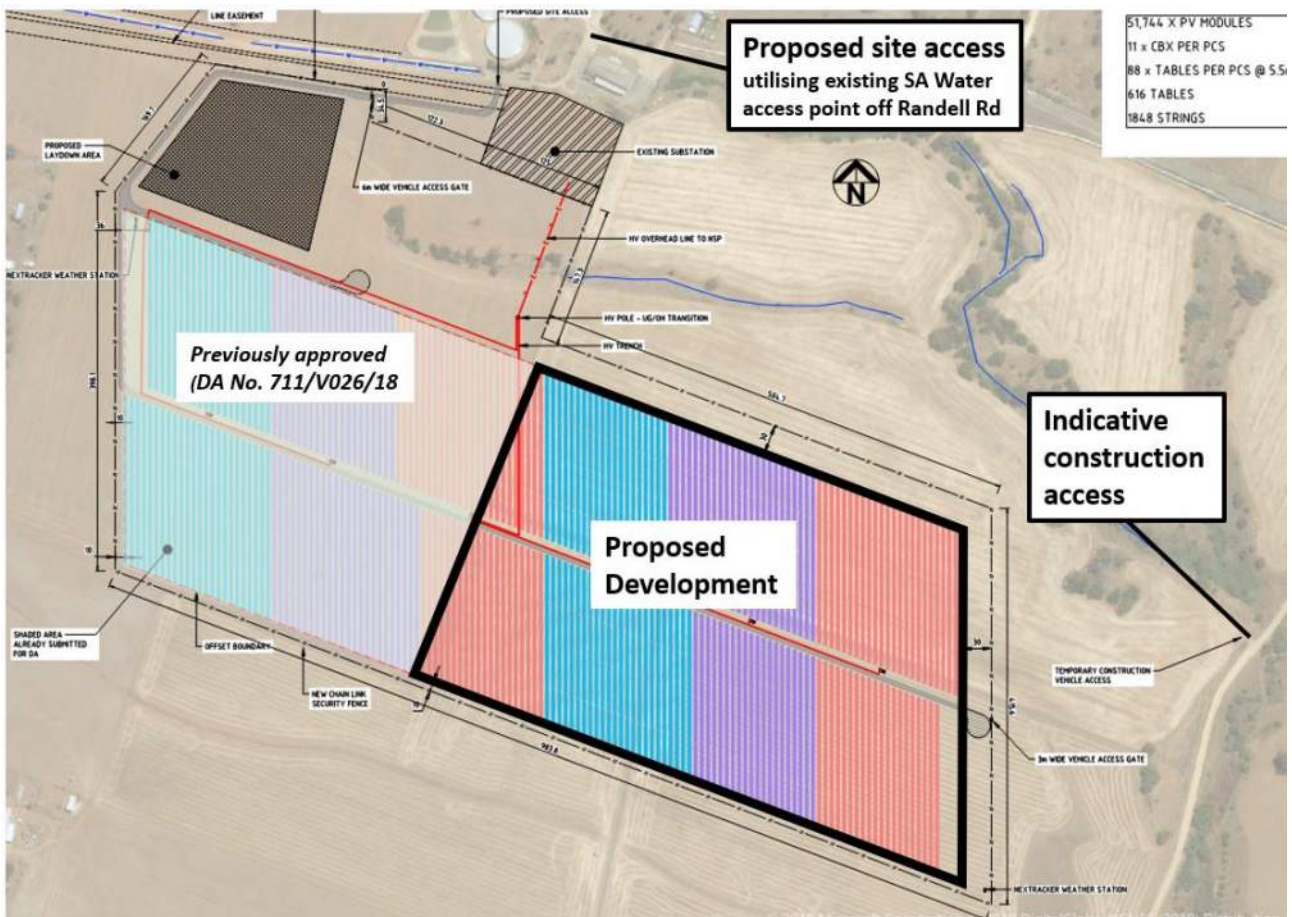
Mannum PPS.2 Solar PV layout design – excerpt from site plan, see Appendix B - Design Drawings for greater detail.
